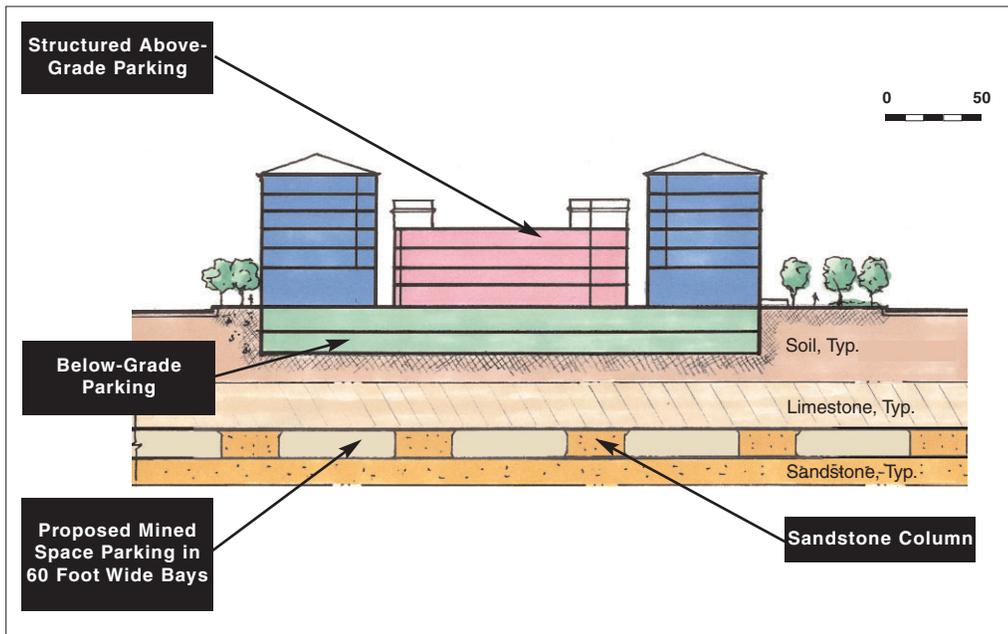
Cross Section illustrating structured above-grade parking, structured below-grade parking, and mined space parking within the sandstone layer.
